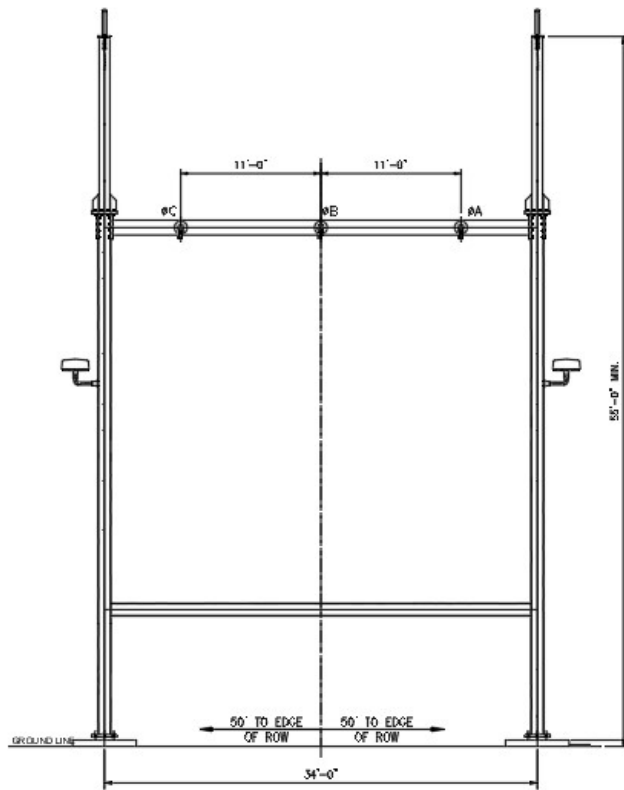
Typical Substation/Switchyard Cross Section – Segment 1
